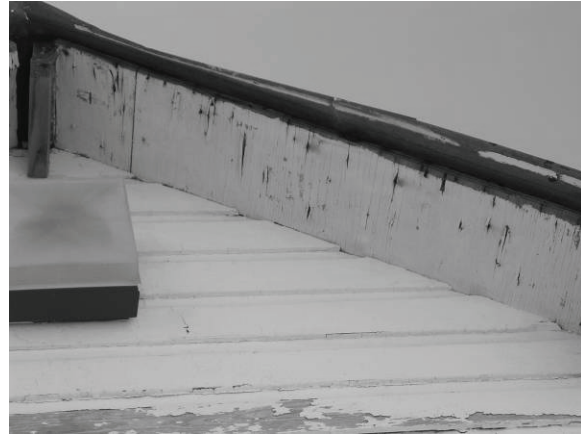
Damage flashing and deteriorating roof decking at east elevation.
